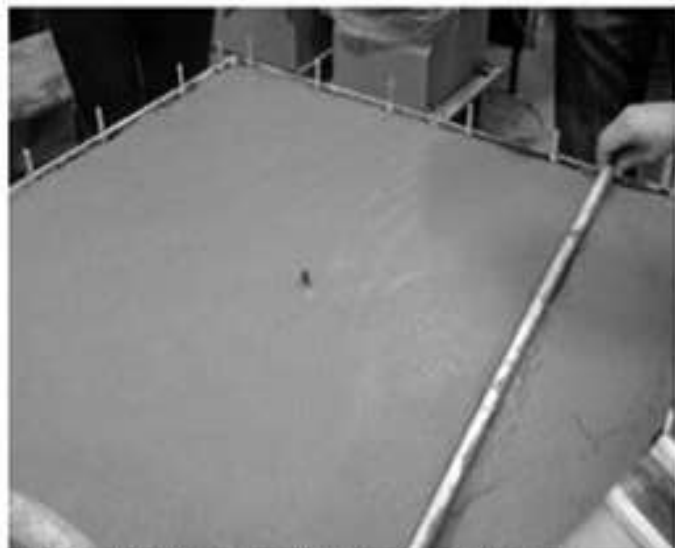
Concrete or fibro concrete mix are smoothed till frame edges
